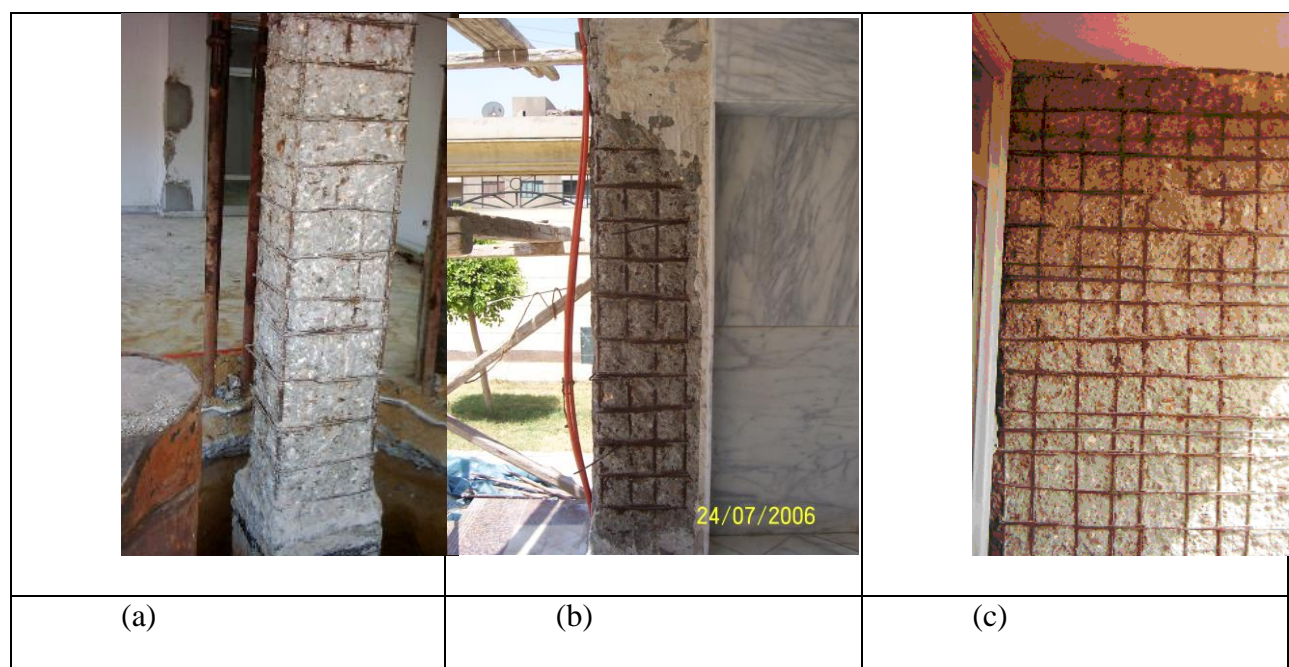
Corroded Steel reinforcement (a) interior column, (b) exterior column, and (c) exterior column
